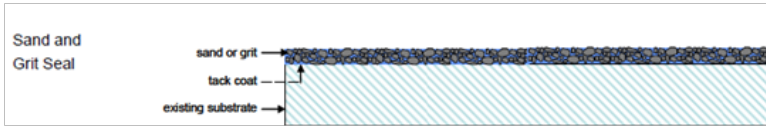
The sand or sandstone chip sealed road pavement cross-section (SANRAL 2007)
